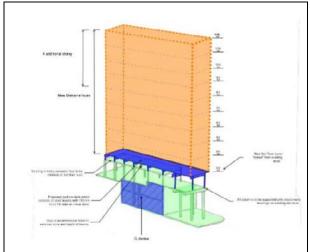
Proposed demolition (red) and proposed light weight structure (orange) on isolating springs (dark blue)
